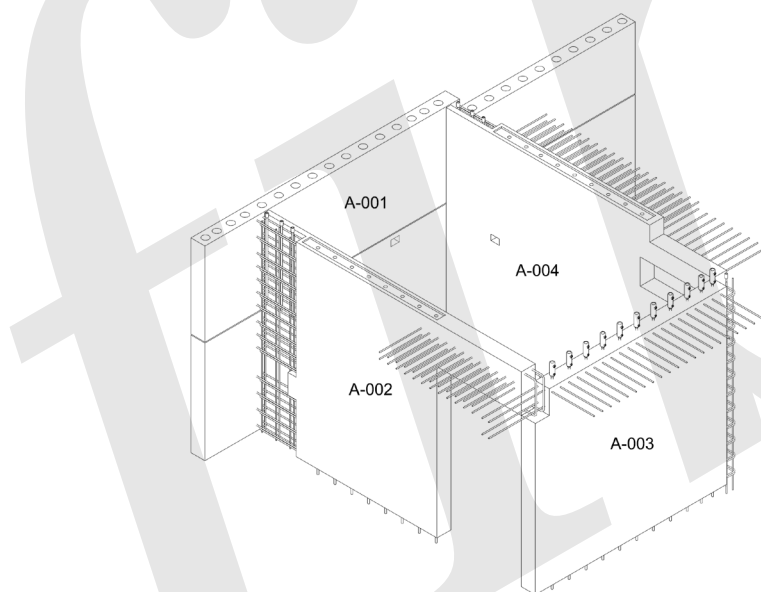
Example of various horizontal and vertical connections between core walls.
